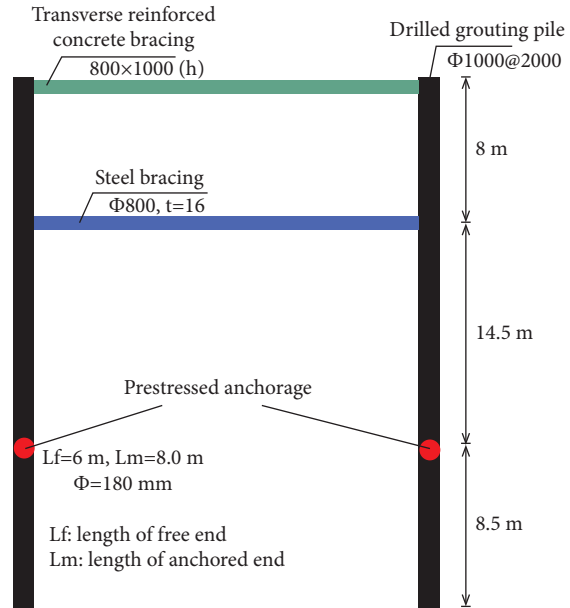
Supporting scheme of the deep foundation pit (note that h in Figure 2 refers to the height of the reinforced concrete bracings, and t in Figure 2 refers to the thickness of the steel bracings).
